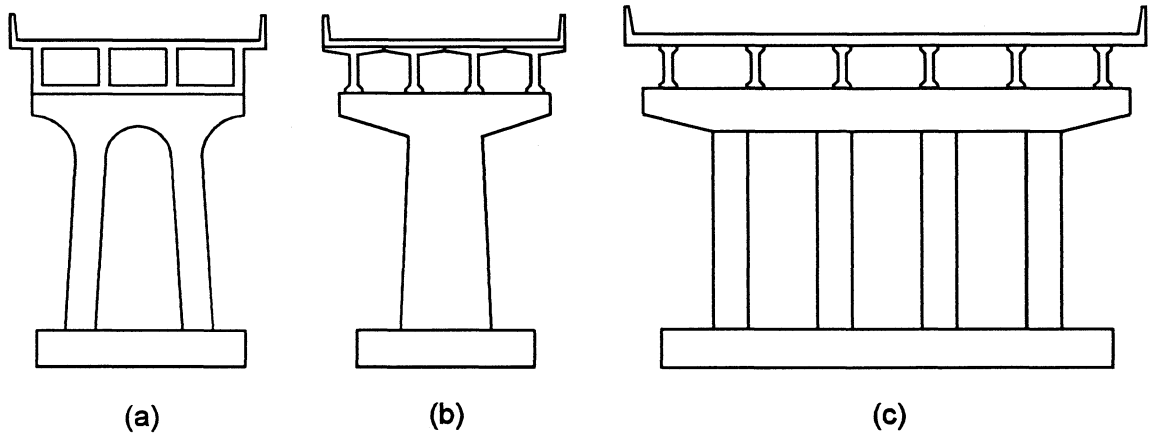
Several typical concrete sub- and superstructure configurations
